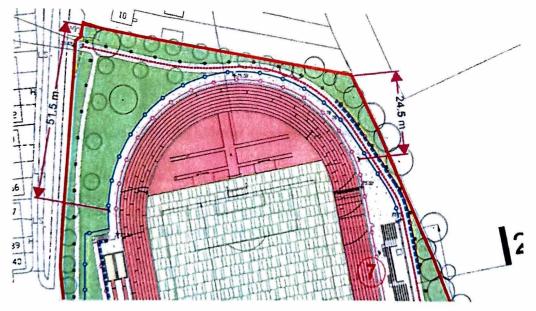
Extract from A2156-100-10 - Tower flood light locations.
